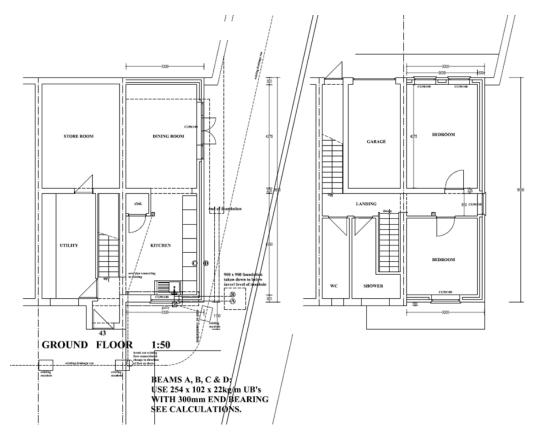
Proposed Ground (left) and First Floor (right) Plan
